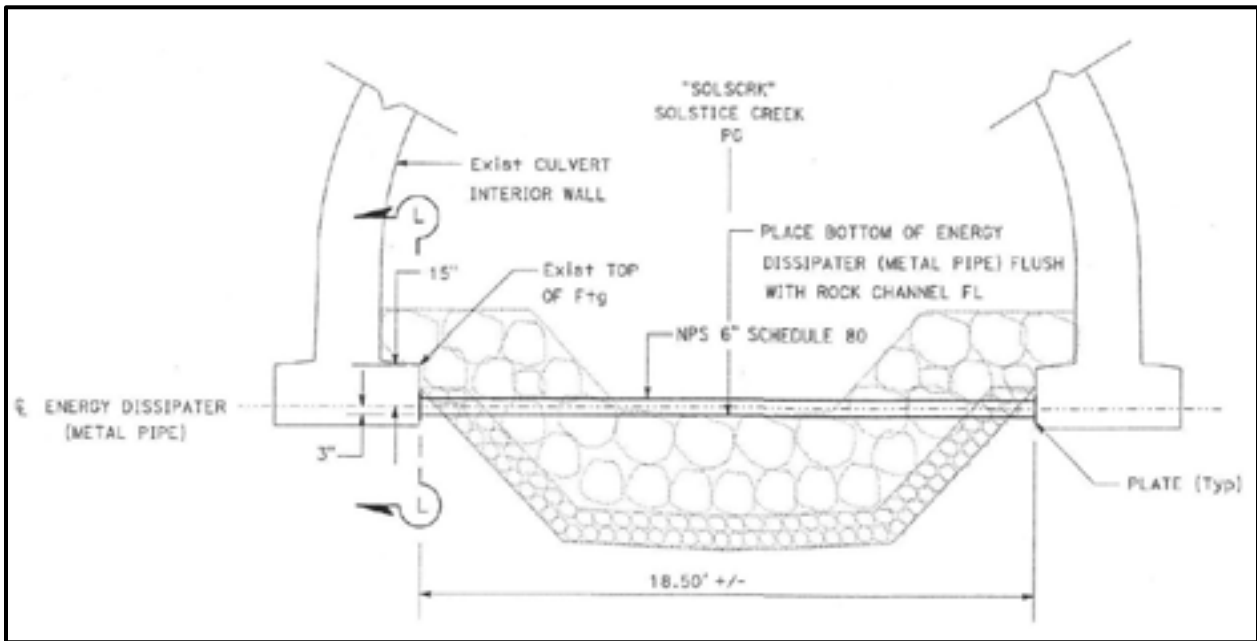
Typical cross-section within culvert. Structural support at the bottom of the culvert would be provided by six-inch steel pipes, spread 10 feet apart in the longitudinal direction.
